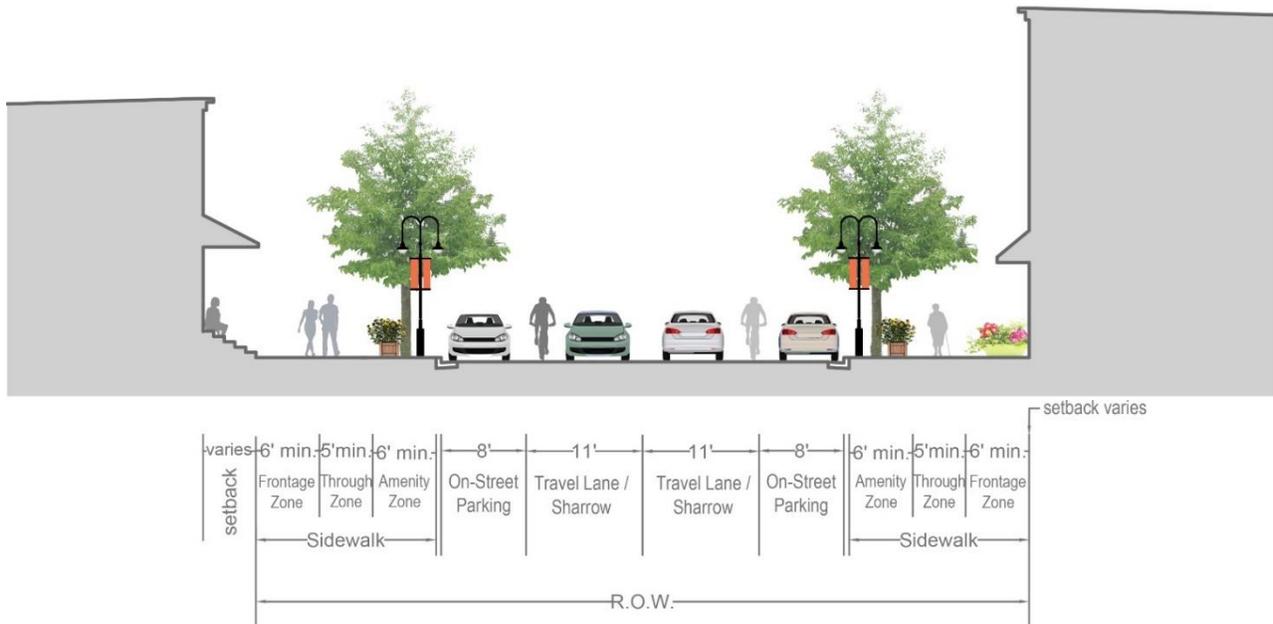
Cross Section Concepts for Streets in the Mixed Use Highway Commercial District
